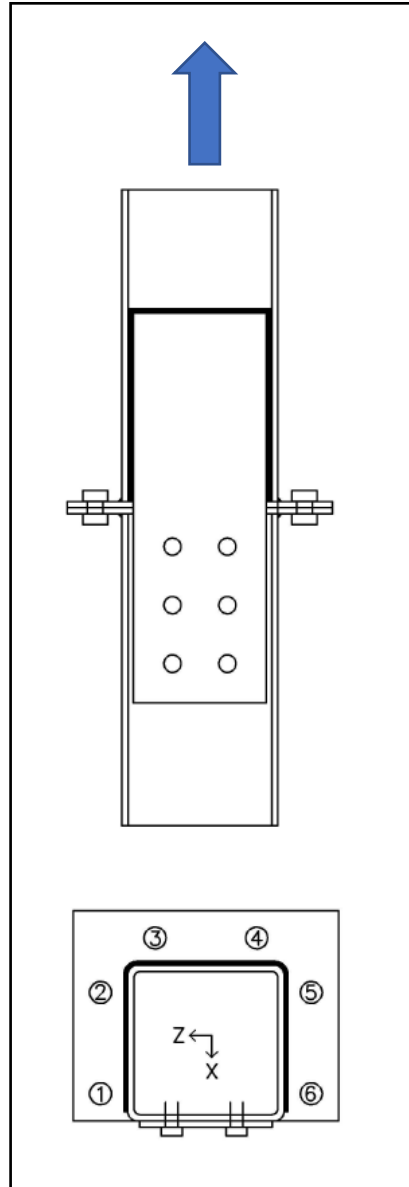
Plan and elevation of specimen IC-1 (case 4)
